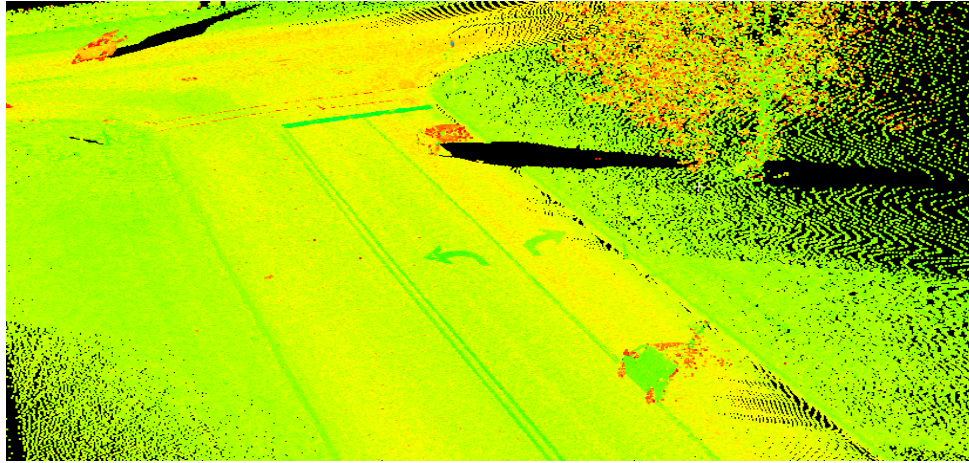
Sample MTLs dataset showing the approach to an intersection highlighting striping on the street and curb and gutter
